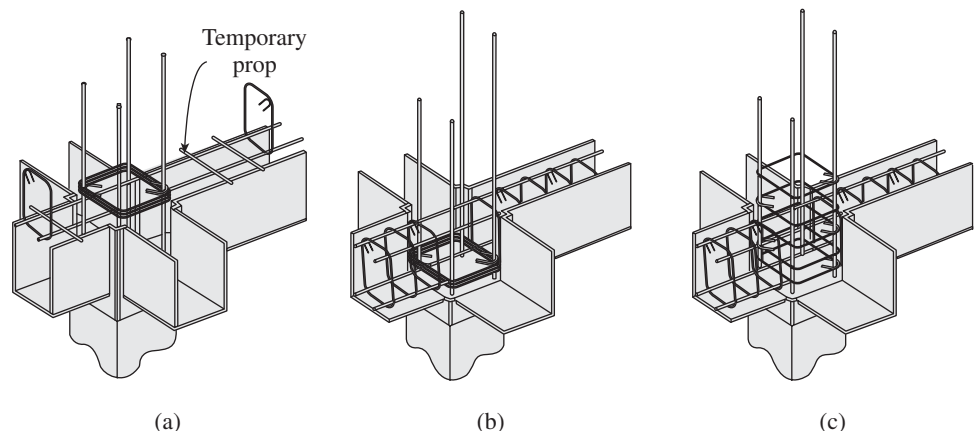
Three stages of providing horizontal ties in beam-column joints (a) Stage 1 (b) Stage 2 (c) Stage 3
